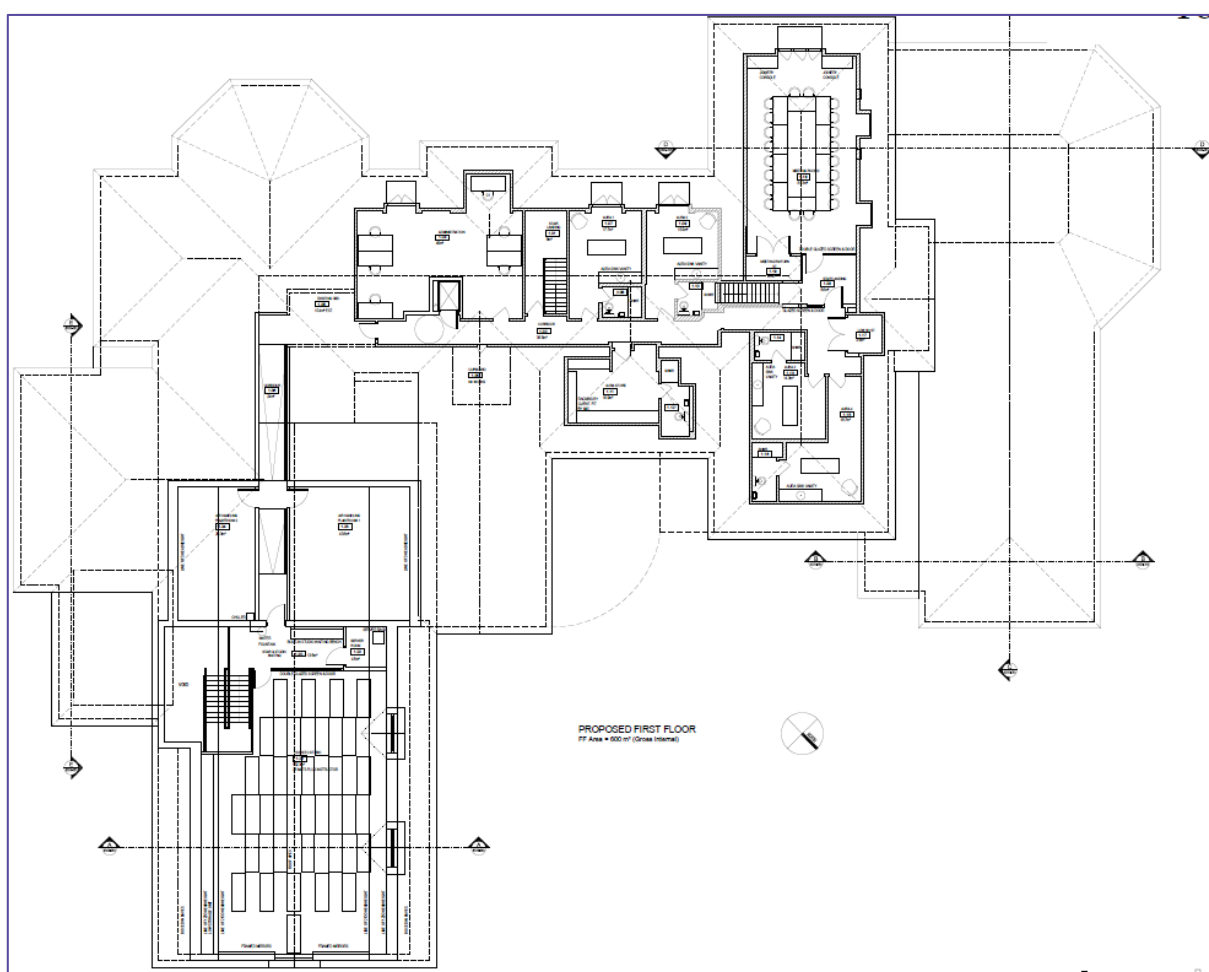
Extract from drawing no. 6309.027.C - Proposed First Floor Plan - 16/0312/S73
